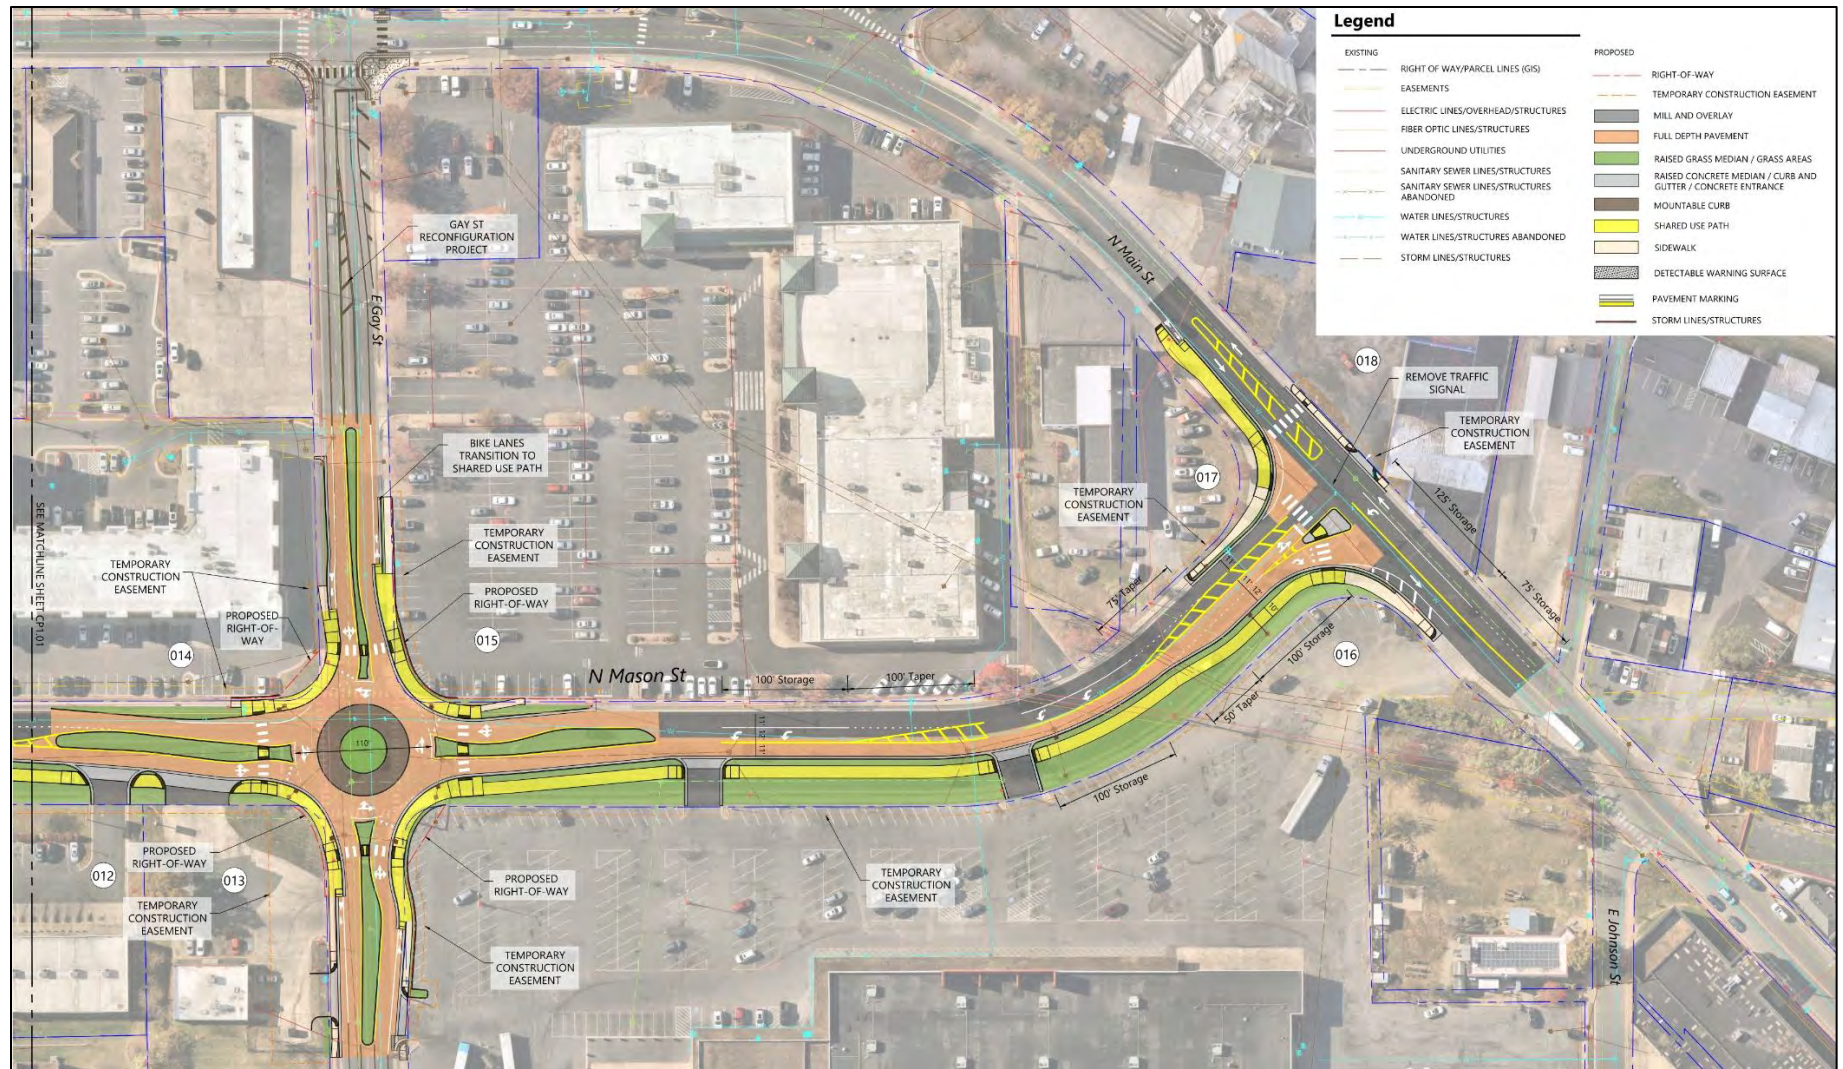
Preferred Alternative Design Sketch, Sheet 2 (E Gay Street to E Main Street)
